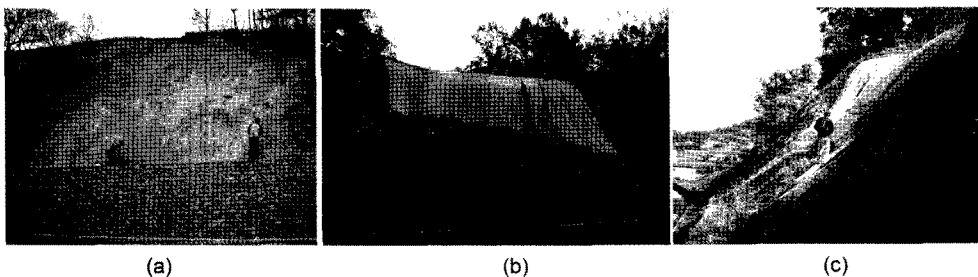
Photographs of slope failures: (a) after the first failure, (b) after the second failure, and (c) lateral view after the second failure.
